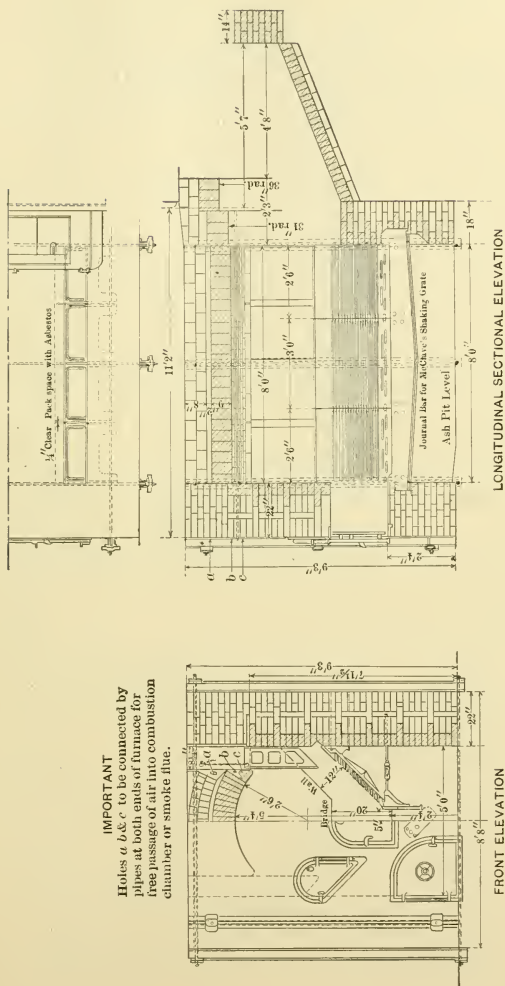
A MYERS FURNACE WITH ADJUSTABLE GRAVITY FEED. ADAPTED FOR BURNING TAN BARK OR SAWDUST
